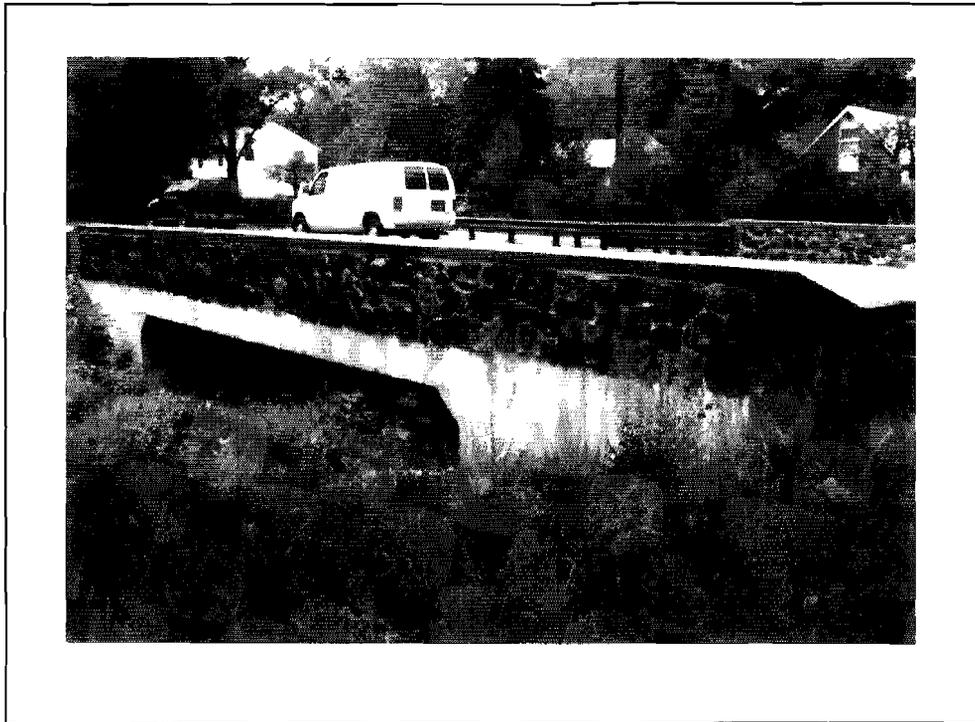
Grubb Road Bridge over South Branch of Naamans Creek (N-12538), West Elevation
